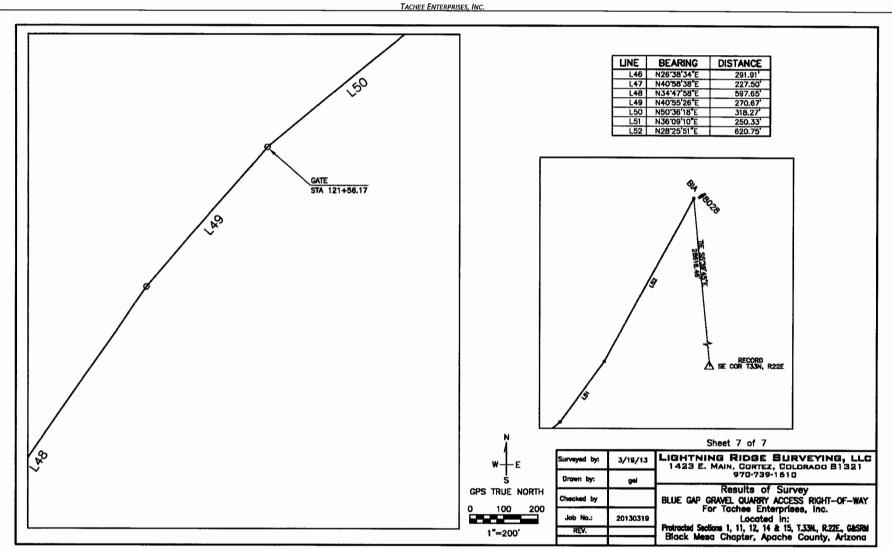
Proposed Access Road ROW plat (Page 6 of 6).
